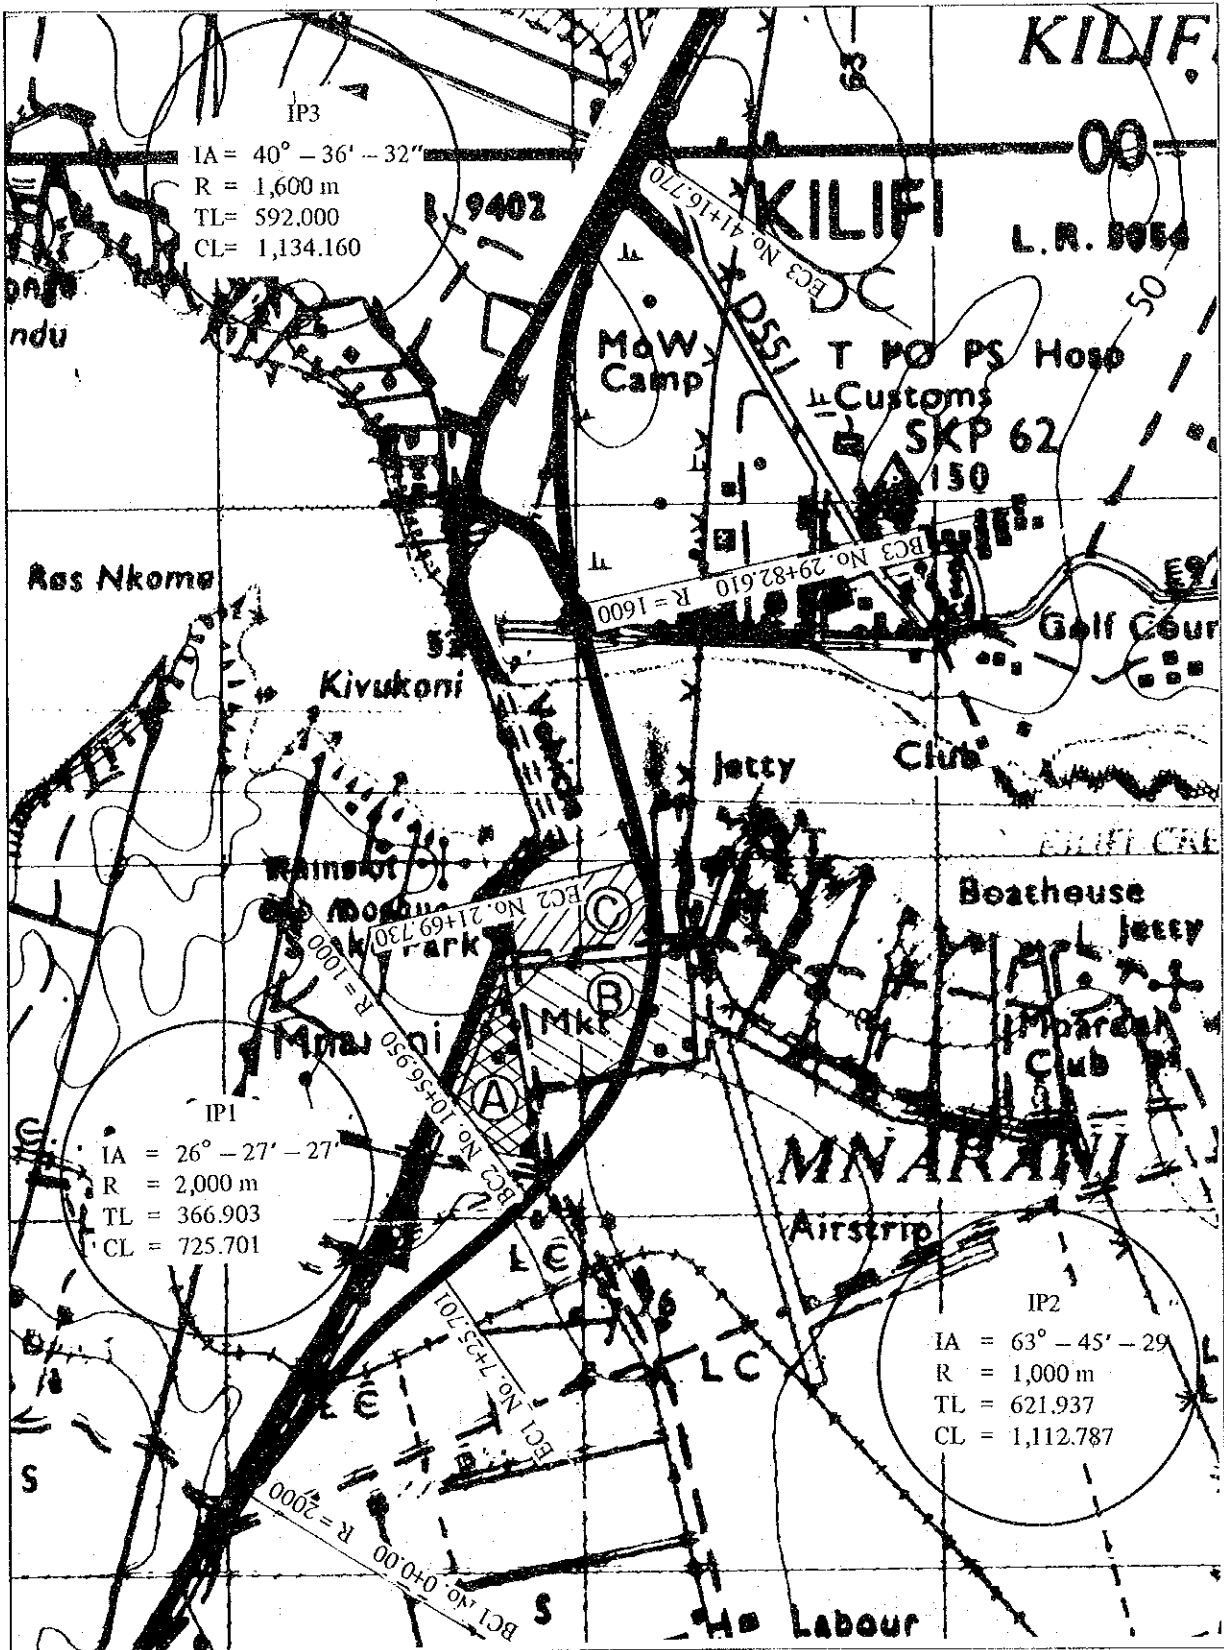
HORIZONTAL ALIGNMENT PLAN
